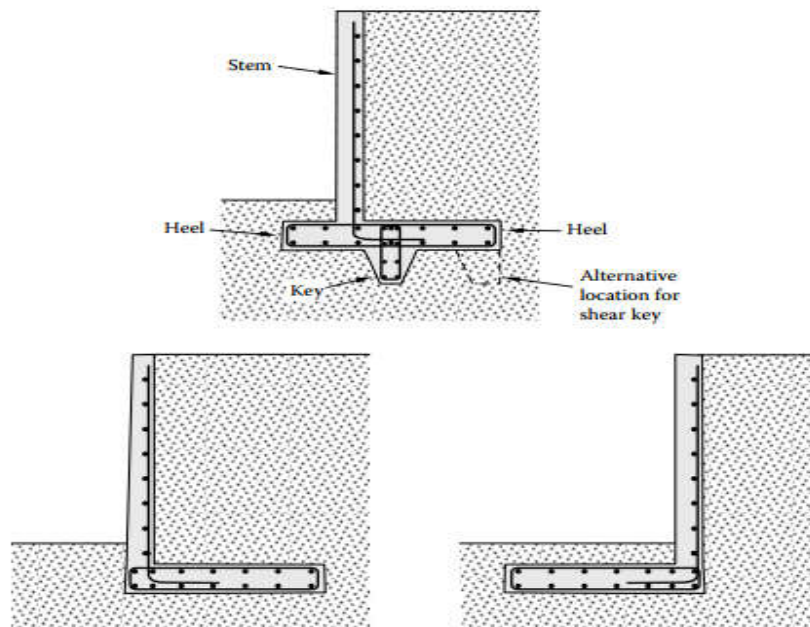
Cantilever Wall (Clayton, Woods, Bond, & Militisky, 2013)
